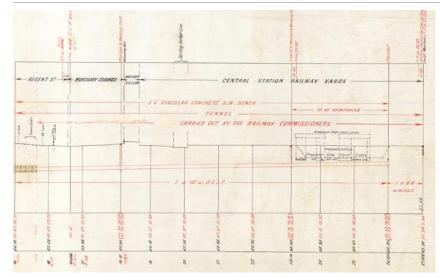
1924 section across Sydney Yard showing the depth of the new alignment in 3' 6" (1.07 metres) concrete pipe laid to the south of the original oviform brick sewer line. Source: Metropolitan Board of Water Supply and Sewerage, City sewerage northern division – diversion of Council's old sewer, Day Labor [sic] 2077 Sheet 2, 1924, Sydney Water Plans, DL2077 (2)
